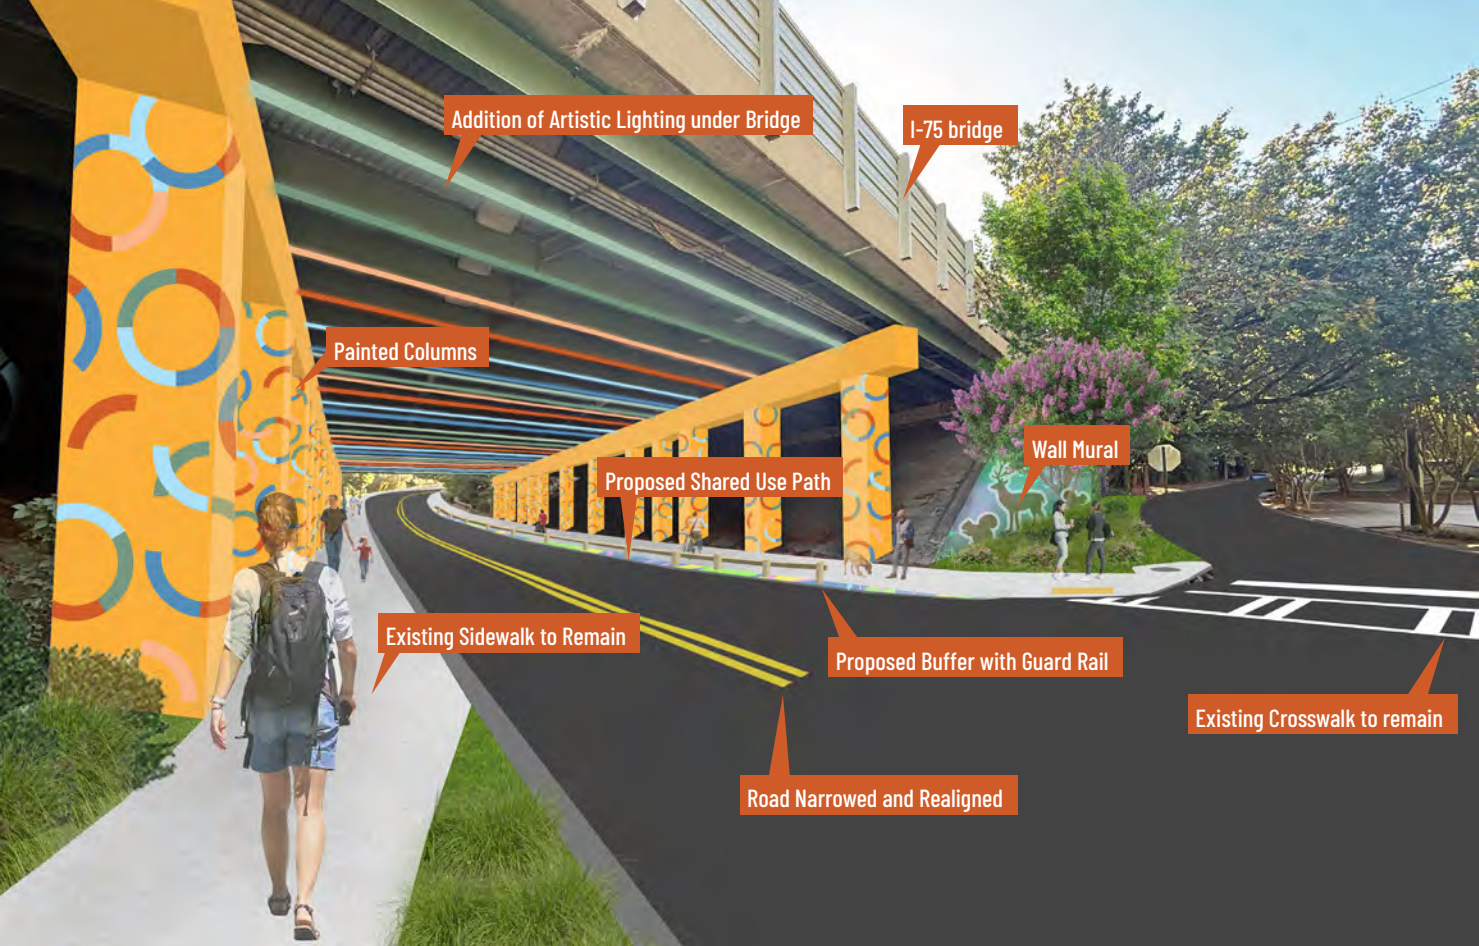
I-75 Bridge Underpass Conceptual Rendering
